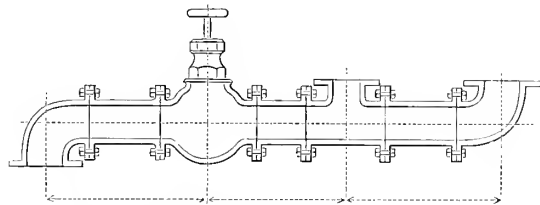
DIAGRAM SHOWING FLANGED JOINTS.
